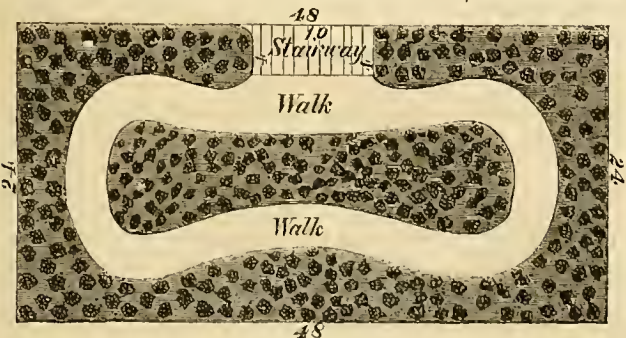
PLAN OF GREENHOUSE WITH PLANTS BEDDED OUT.
